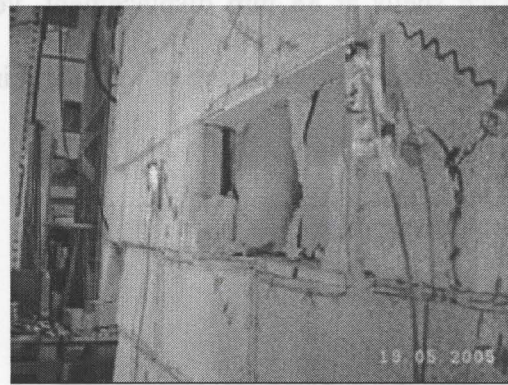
60: Bulging of face shells at 88 mm top deflection (Wall 5)
